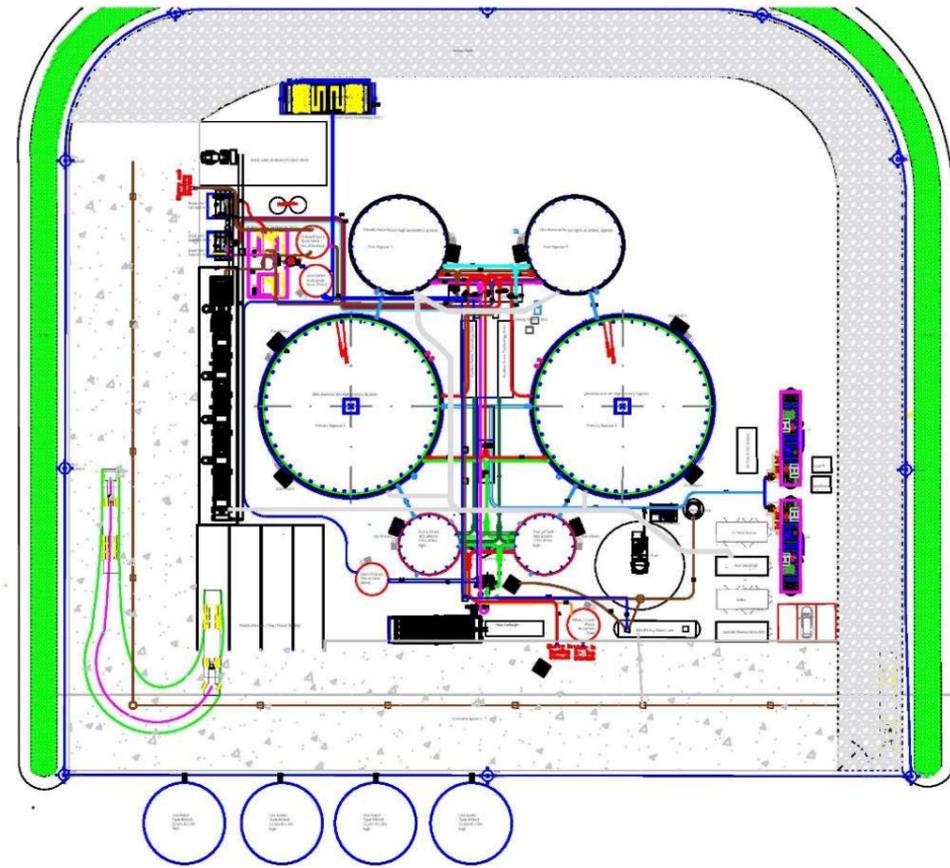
Site layout and elevation: Southern perspective of the Proposed Fertiliser Facility
